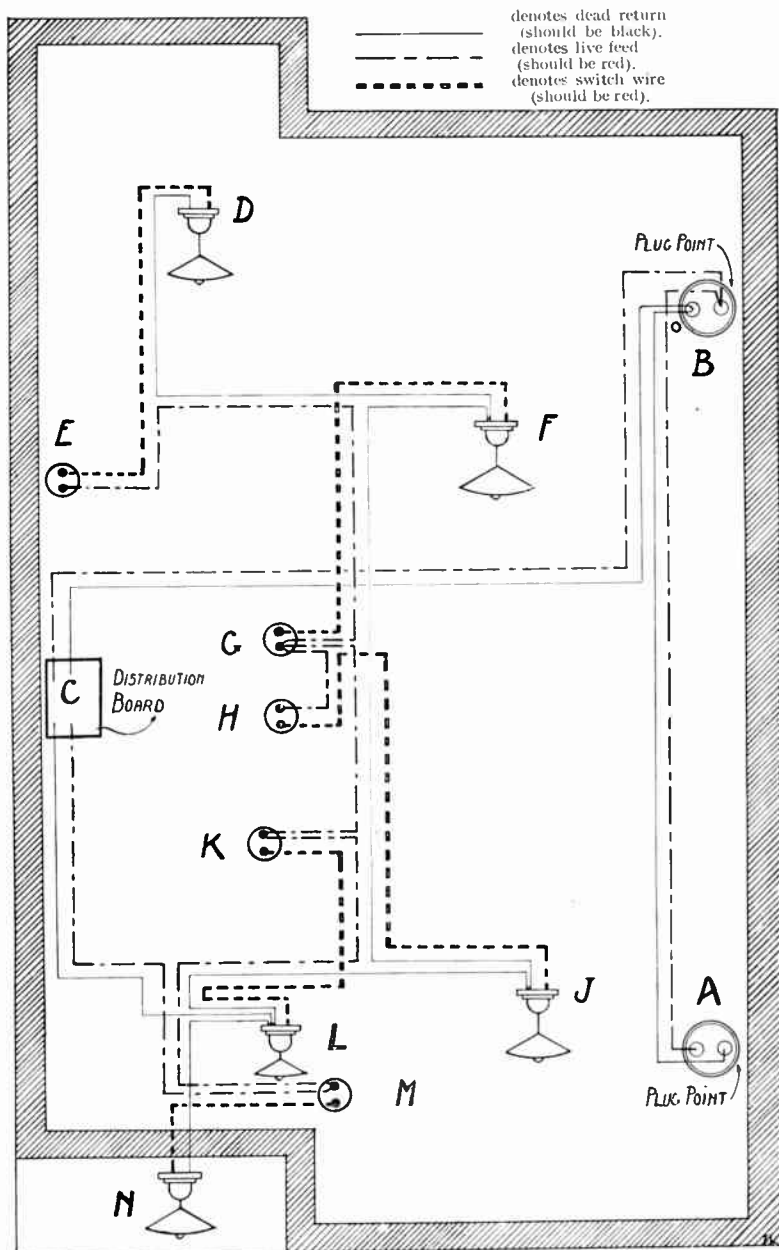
TRACING THE WIRES IN THE CONDUIT.
